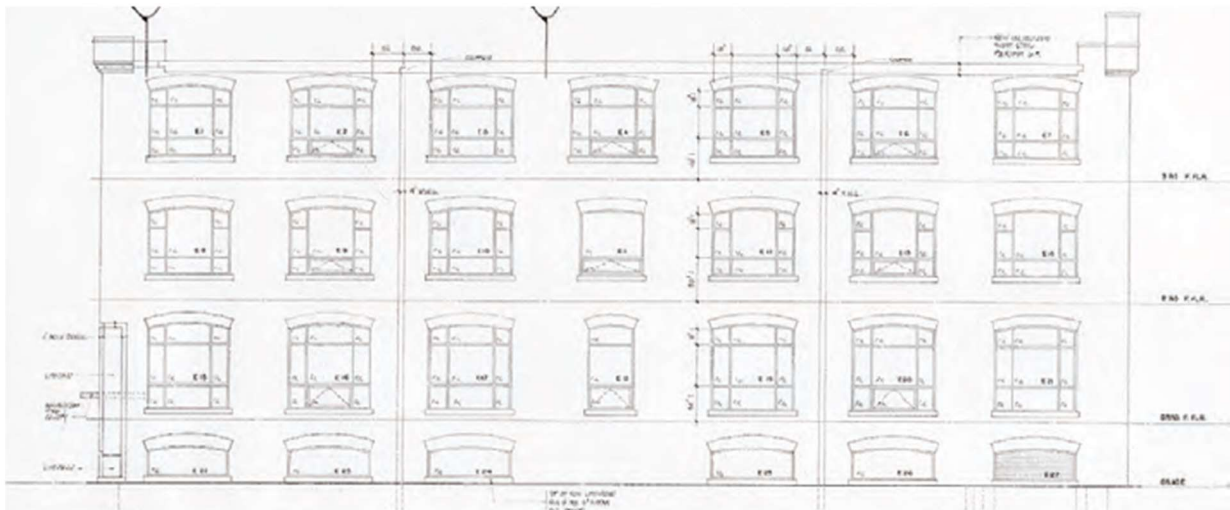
1990 building permit drawings, east elevation (Toronto Building Records).
